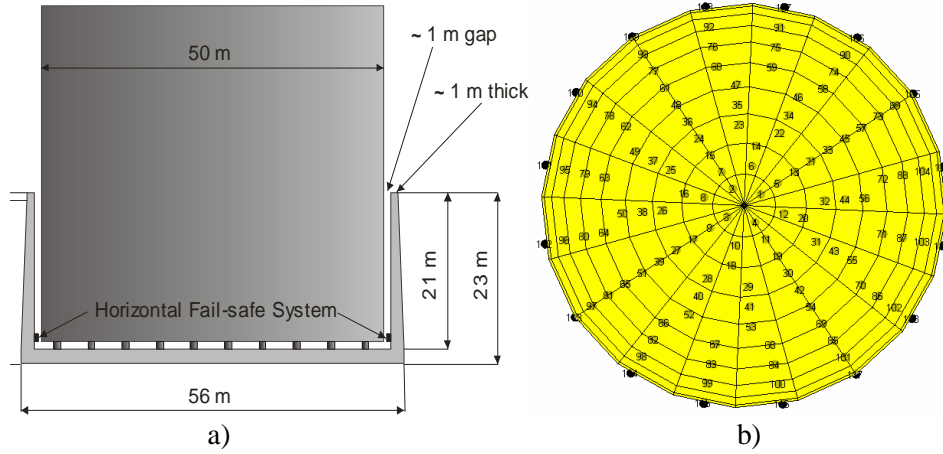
IRIS NSSS building (a); isolators layout (b)
